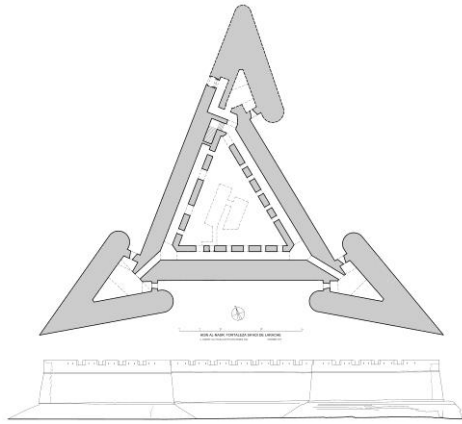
Plan and elevation of the Hisn al-Nasr in Larache
